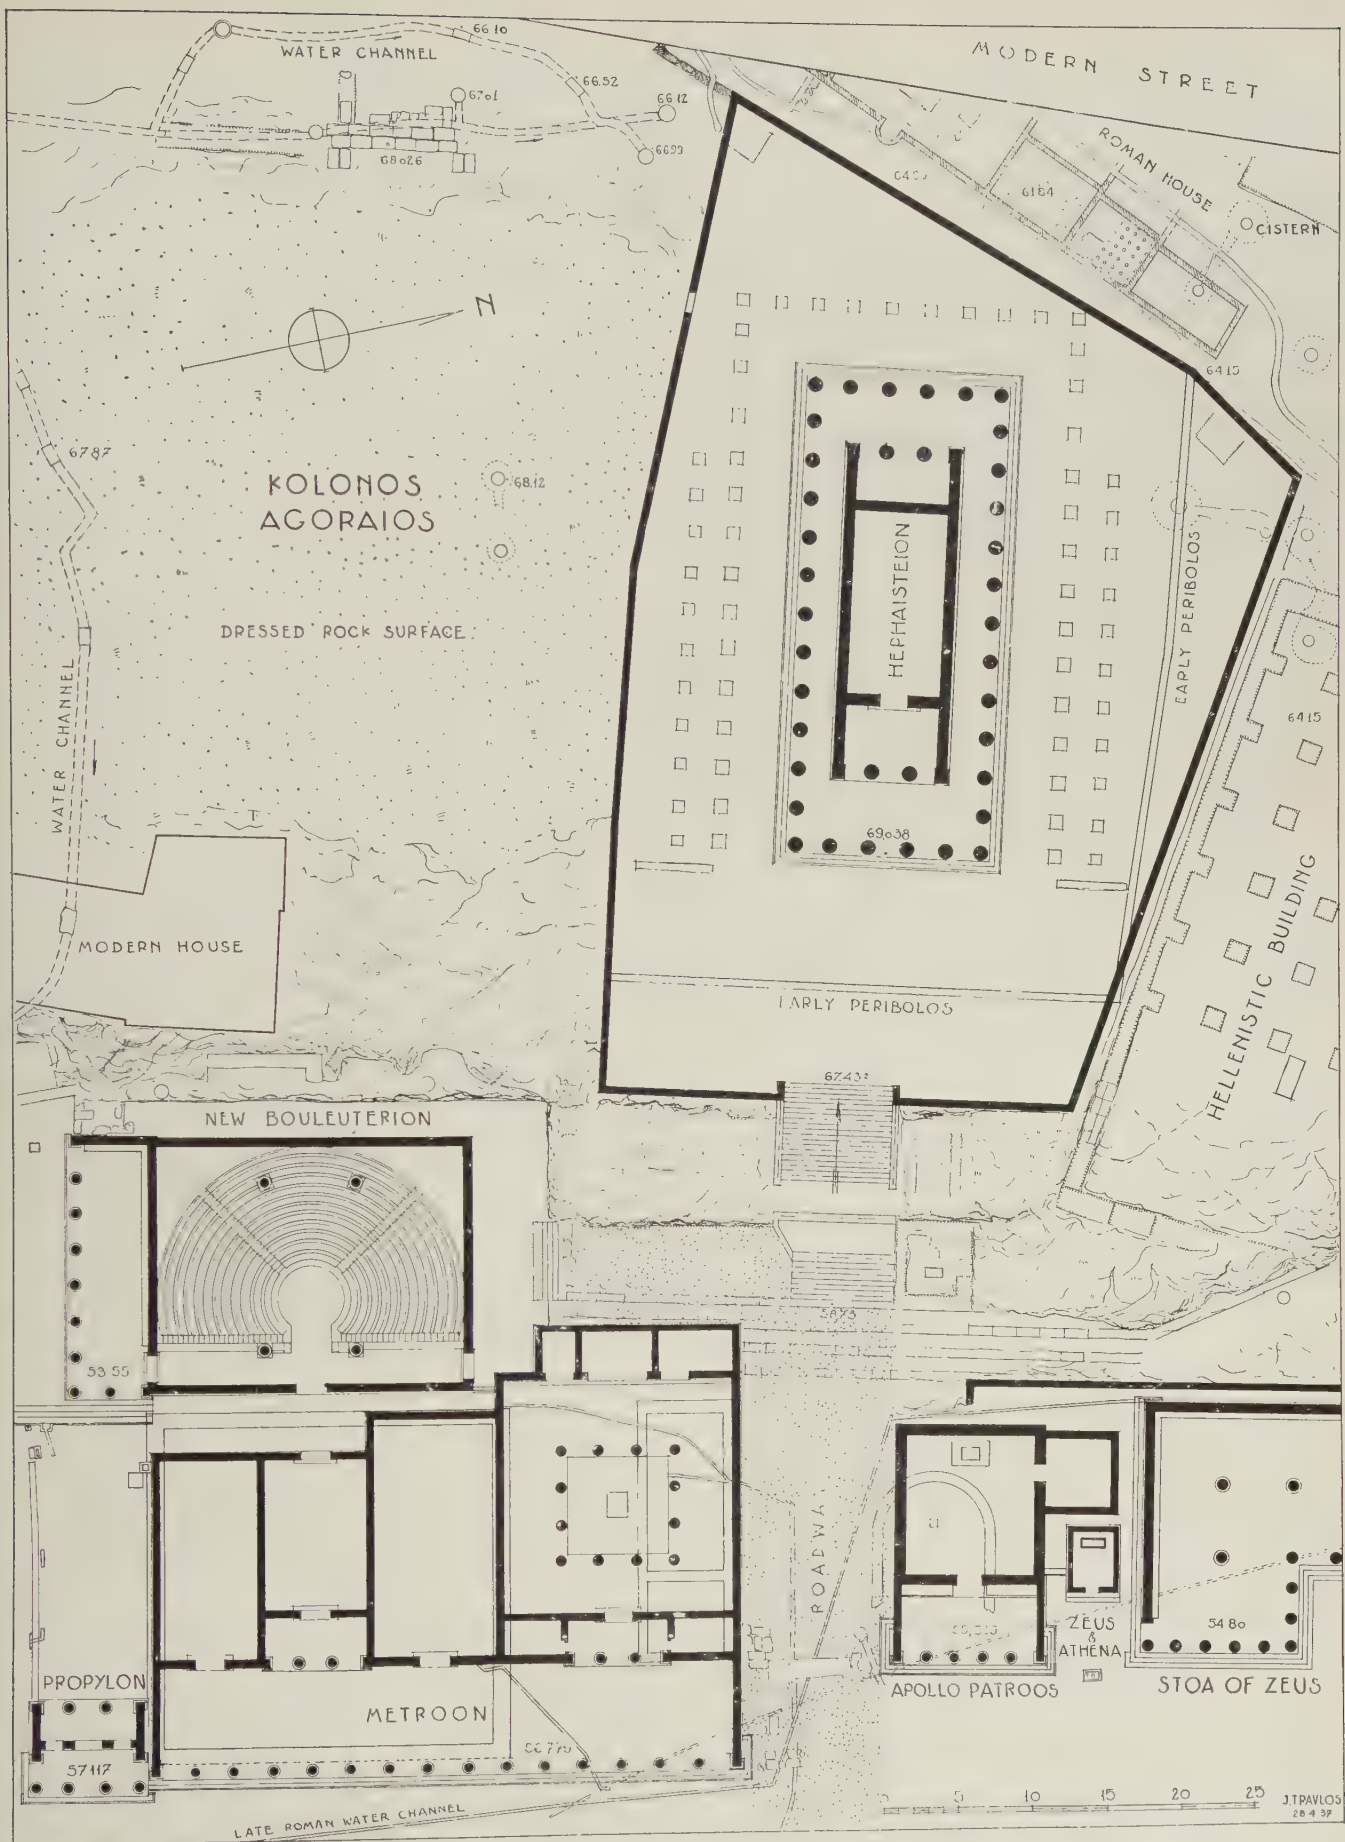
Hephaisteion Precinct and Surroundings, Restored Plan
